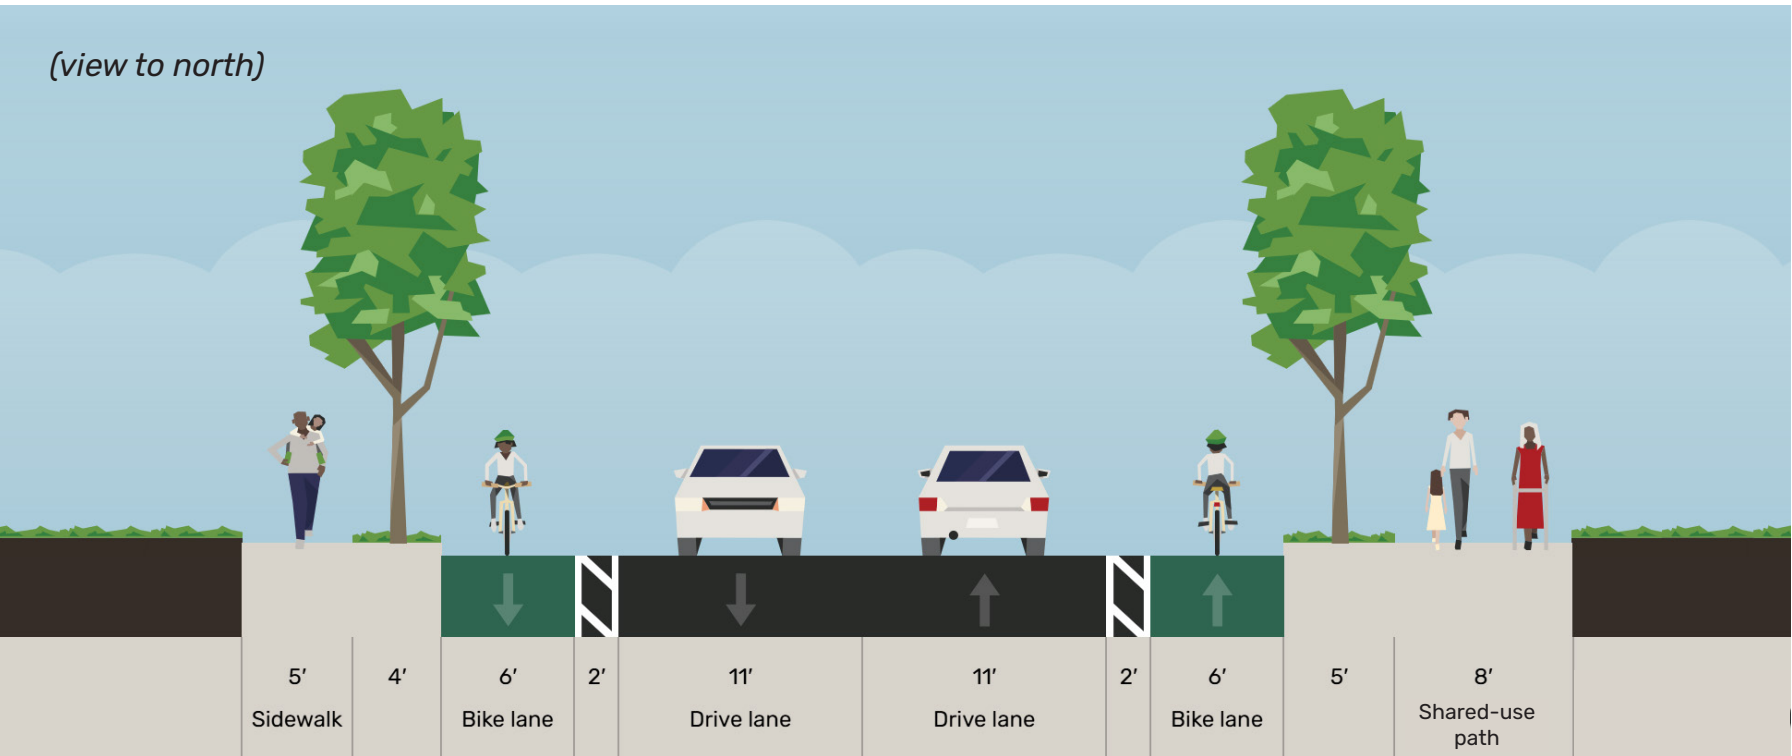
Proposed Typical Cross-Section on Parkridge Drive (60' ROW)
